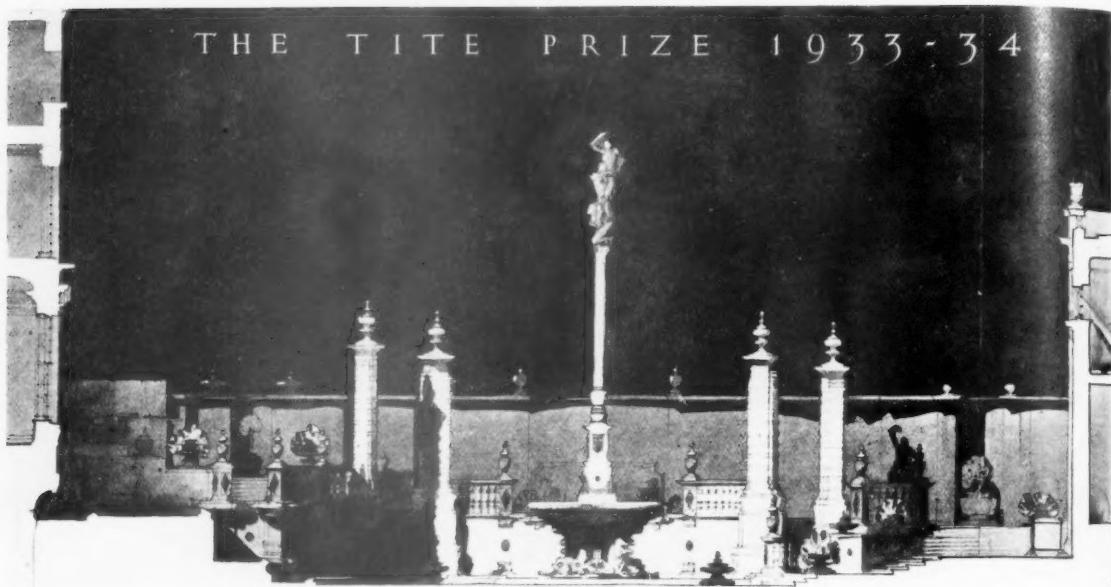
A WALLED GARDEN AT THE REAR OF A LARGE LONDON HOUSE
